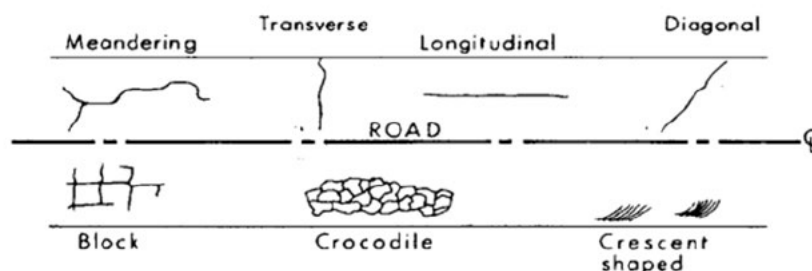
Cracking Defects (Austroads, 2011, pp. 133)
